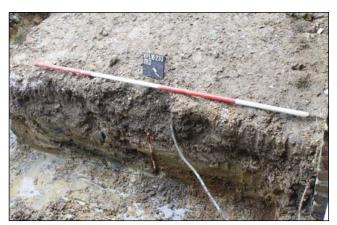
Footing trench, looking North north east. Scales: 2m and 0.50m.
